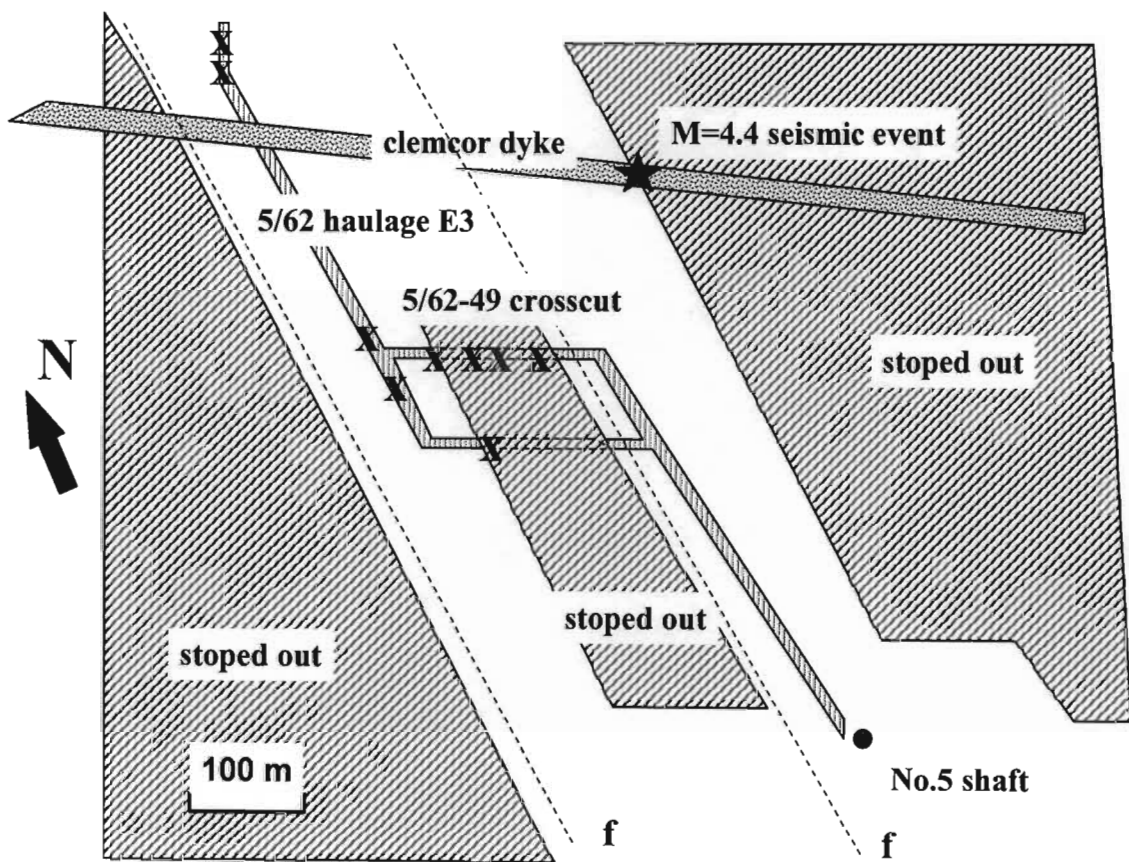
Schematic plan of 62 level tunnel damage Vaal Reefs No.5 shaft
